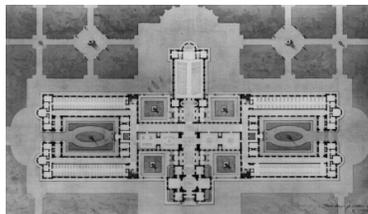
Museum Plan with Exterior Spaces and Auditorium
